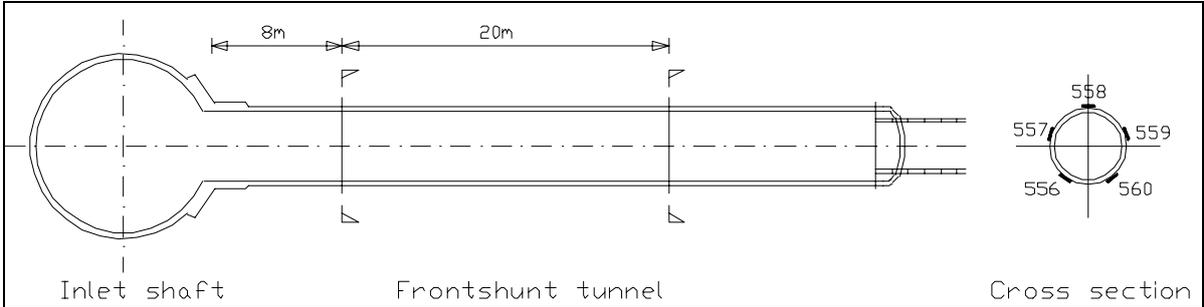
Plan and cross-section of T5 pressure cell locations.
